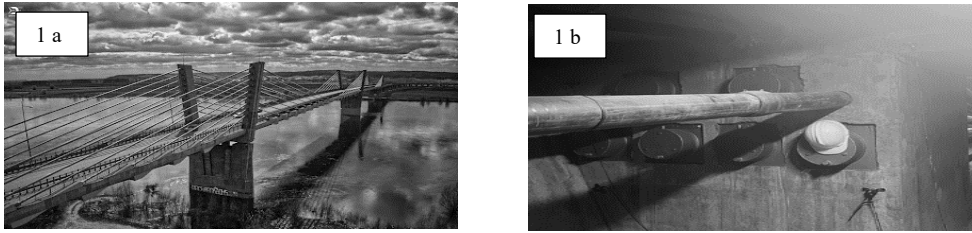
View of the bridge (1a) with an internal anchor block for prestressing cables (1b)
